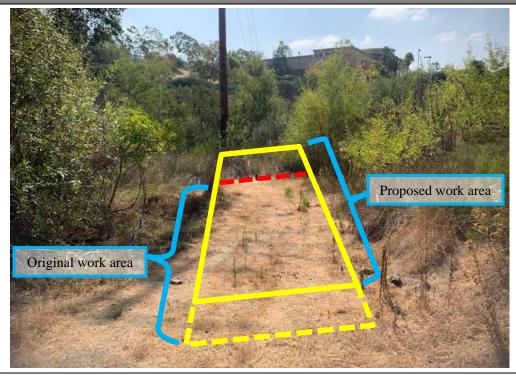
Overview of proposed crane work area vs. original work area. End of maintained access road indicated by red dashed line. Outrigger placement will be within natural openings in vegetation under the guidance of a biological monitor. View south on October 8, 2020.
